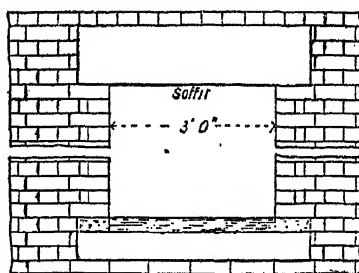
Elevation of opening in Brick Wall, showing Stone Head and Sill.
